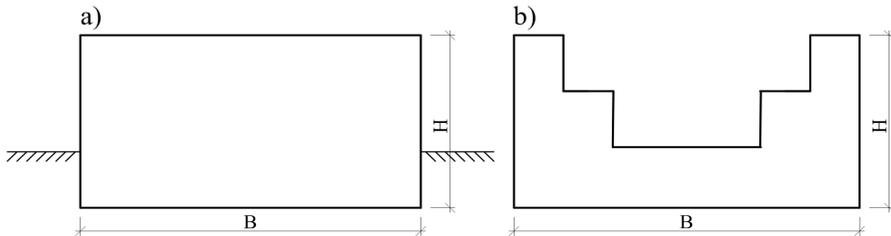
Schemes of block foundations; a) foundation block, b) wall foundation
